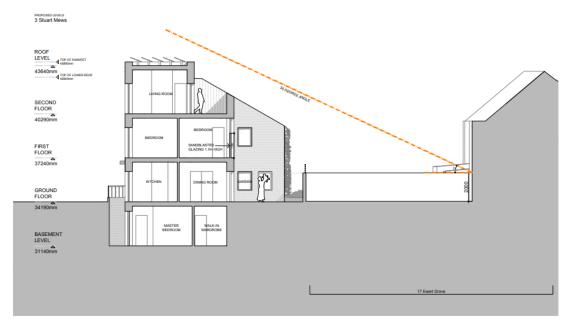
Cross section of closest habitable room windows along Ewart Grove to tallest part of proposal.
